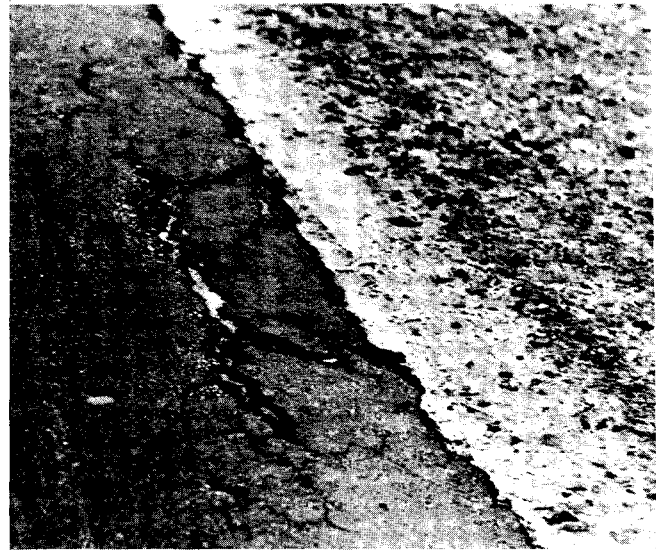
Flexible pavement edge cracking (15).
